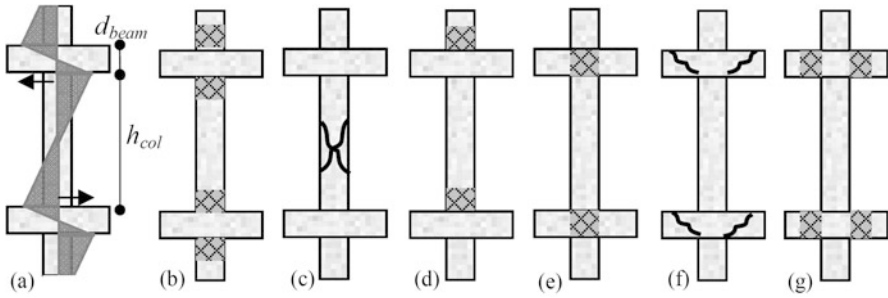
Moment distribution and (b)–(f) possible failure modes of a reinforced concrete columns: (b) Flexural yielding, (c) Shear failure, (d) Bar anchorage/lap-splice failure, (e) Joint shear failure, (f) Connection punching failure, (g) Column shear limited by plastic hinging in the beams ⇒ ductile frame behaviour
